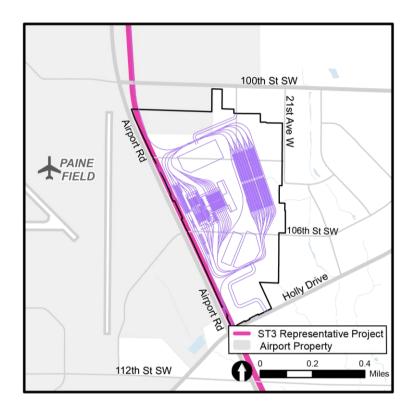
OMF Site: Airport Rd & 100th St SW (Site E) Conceptual Layout
